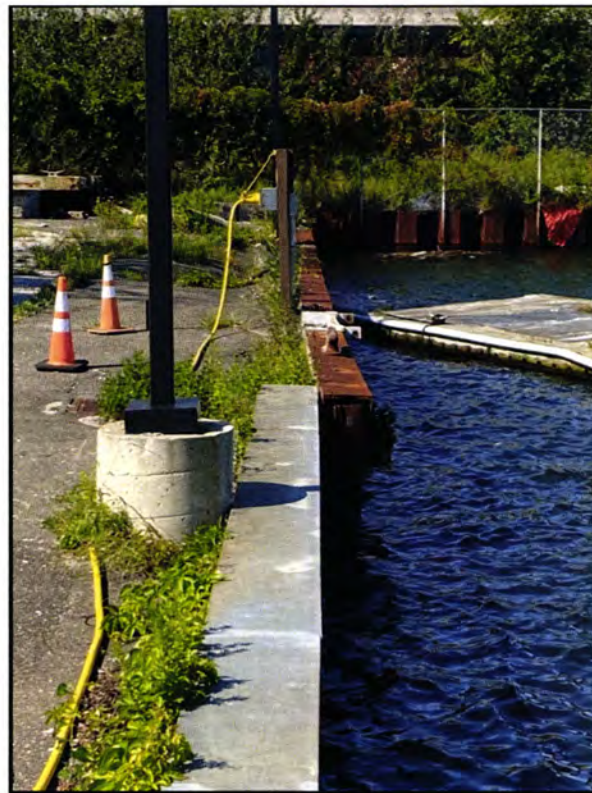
Close-up view of storm damaged dock, looking west from bulkhead Sta. 3+00
